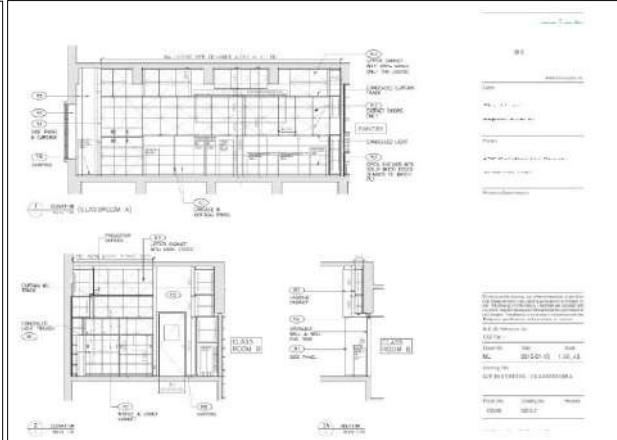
One of the Elevation Drawings in the set of Tender Drawing
